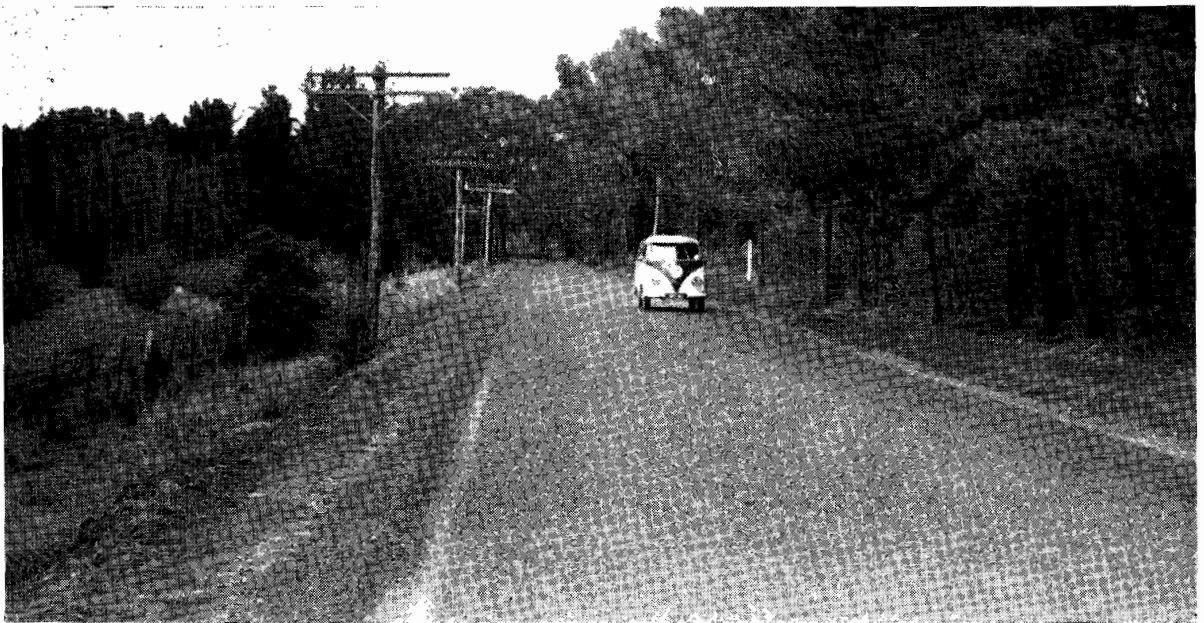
Shire of Flinders. Completed section of Merricks Road at North Merricks.
